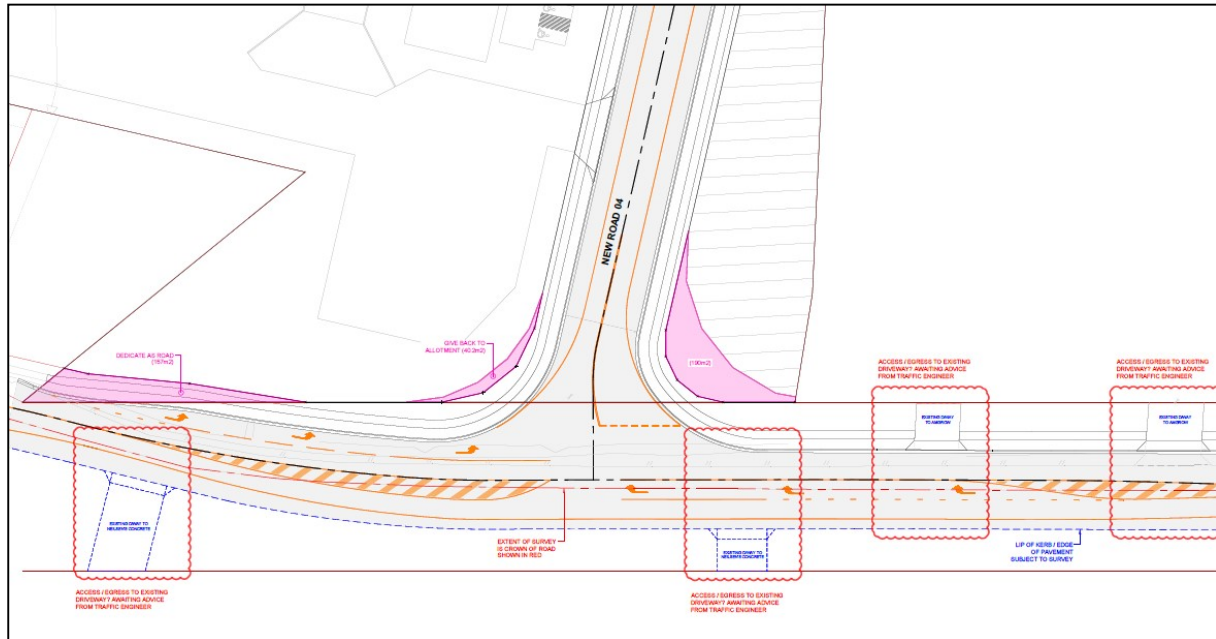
PROPOSED STAGE 3 PLAN
